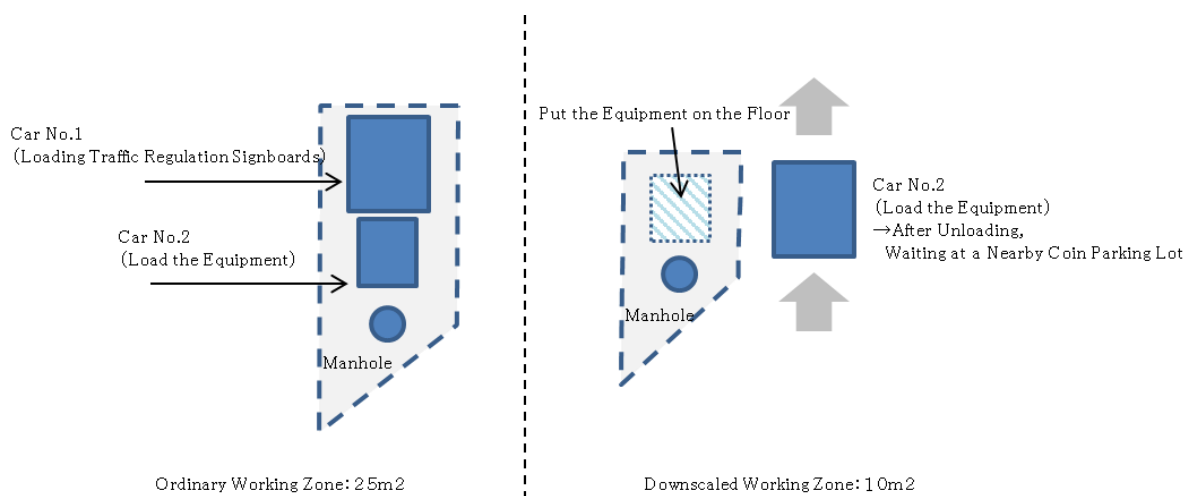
Schematic Picture Before and After Assembling Cutting Machine
